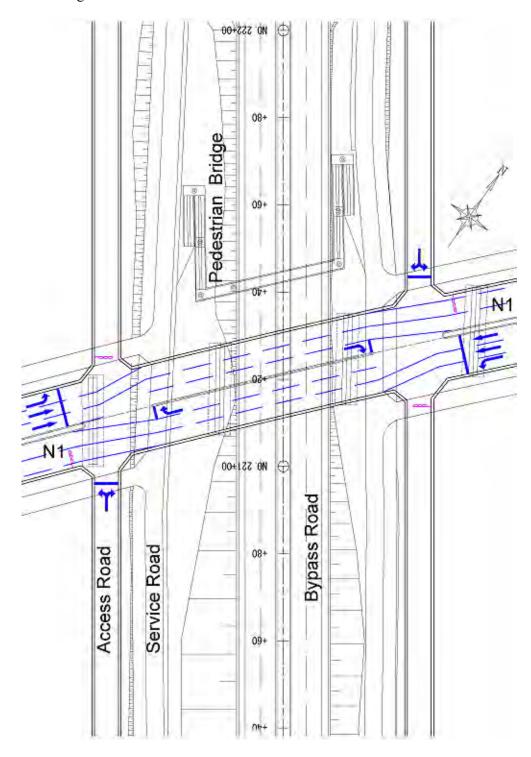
Traffic Lane Configuration at the Flyover Bridge for connecting with N1 and Bypass Road
